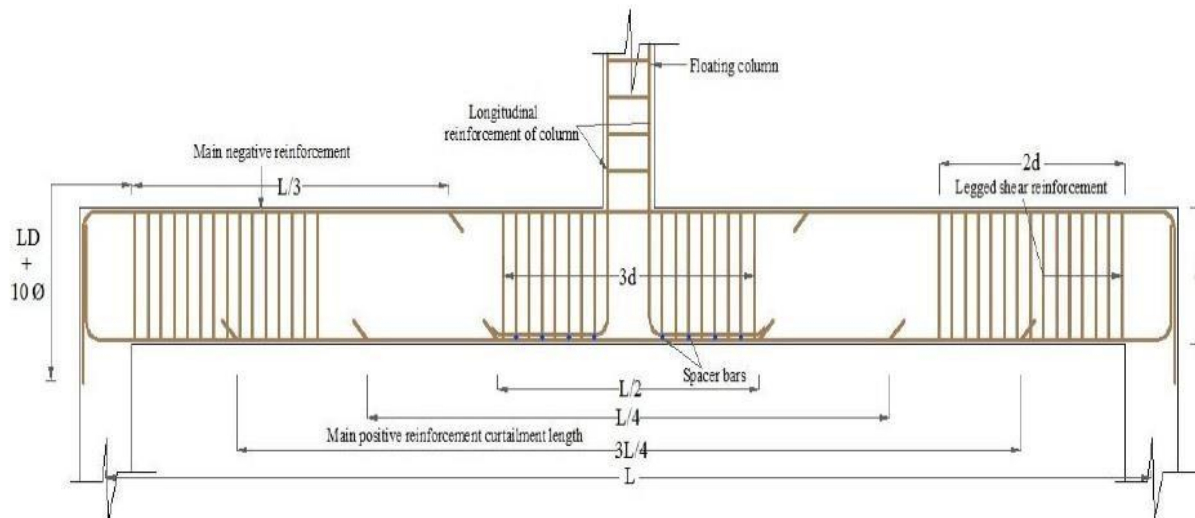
5 Proposed reinforcement detailing of floating column and its supporting members
